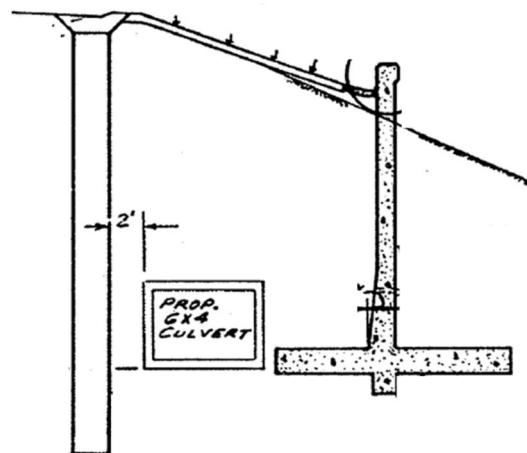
Configuration of Structures for Special Locations (CSJ: 0016-07-081 As-built Plans, 1981⁹)
